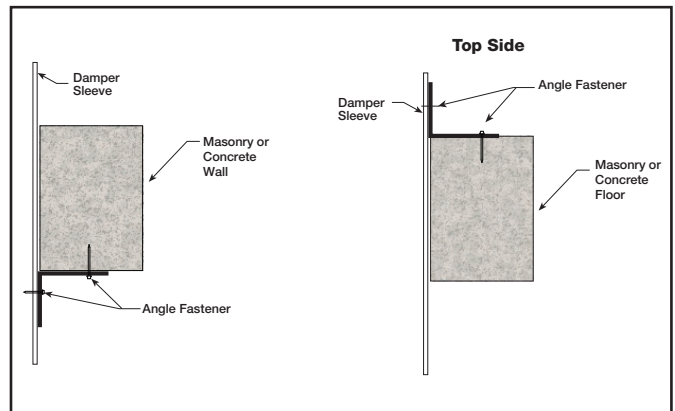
Single Side Angle With Masonry or Concrete Wall and Floor
